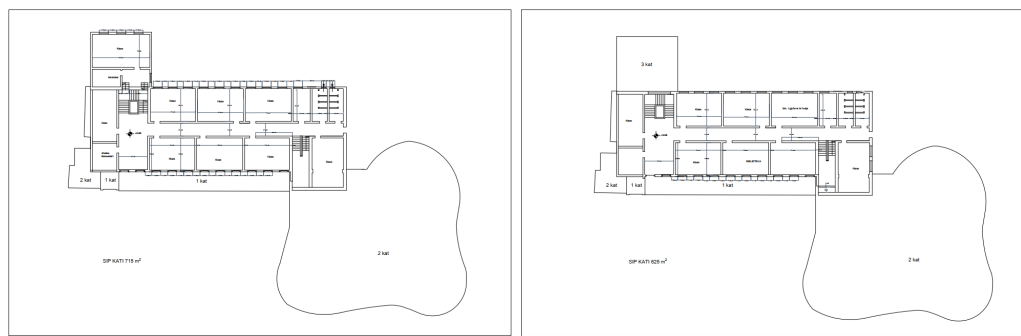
Sami Frasheri school (1963) plans- second floor (left) and third floor (right)
